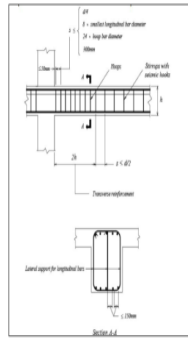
Transverse reinforcement requirement for Beam for SDC-D (SMRF)
